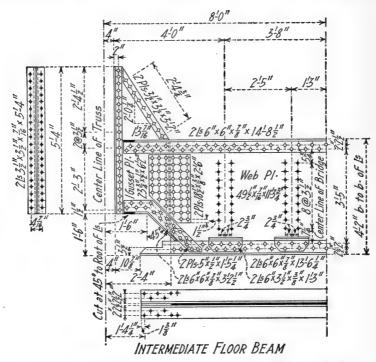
Intermediate Floorbeam Connection. A. T. & S. F. Ry.
